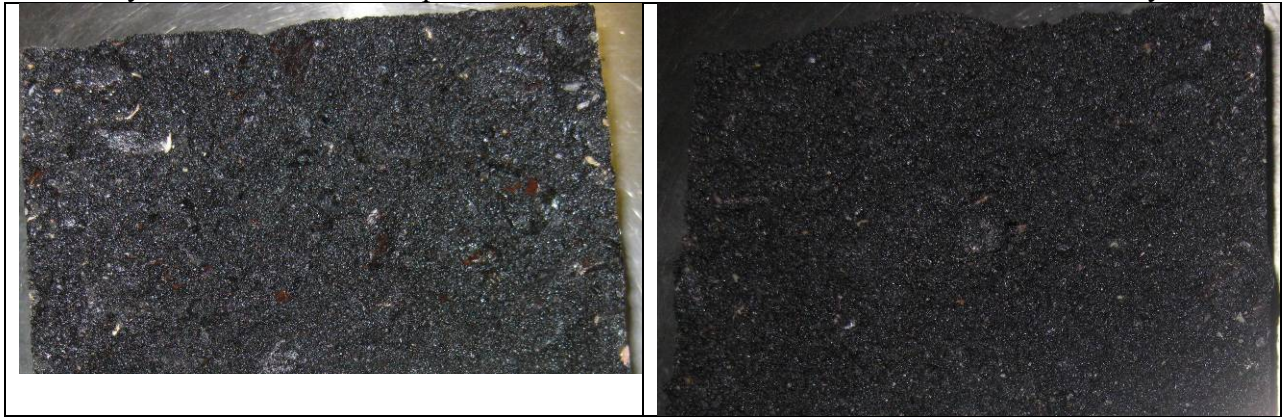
7% and 14% Air Void Specimens (left and Right) *before* Modified Boiling Test
